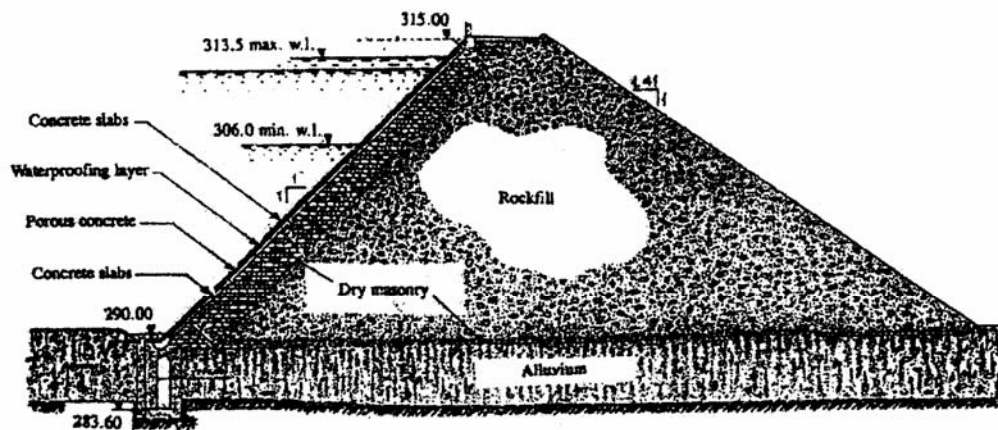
Cross-Section of Sabetta Dam in Italy (Sembenelli and Rodriguez 1996).
